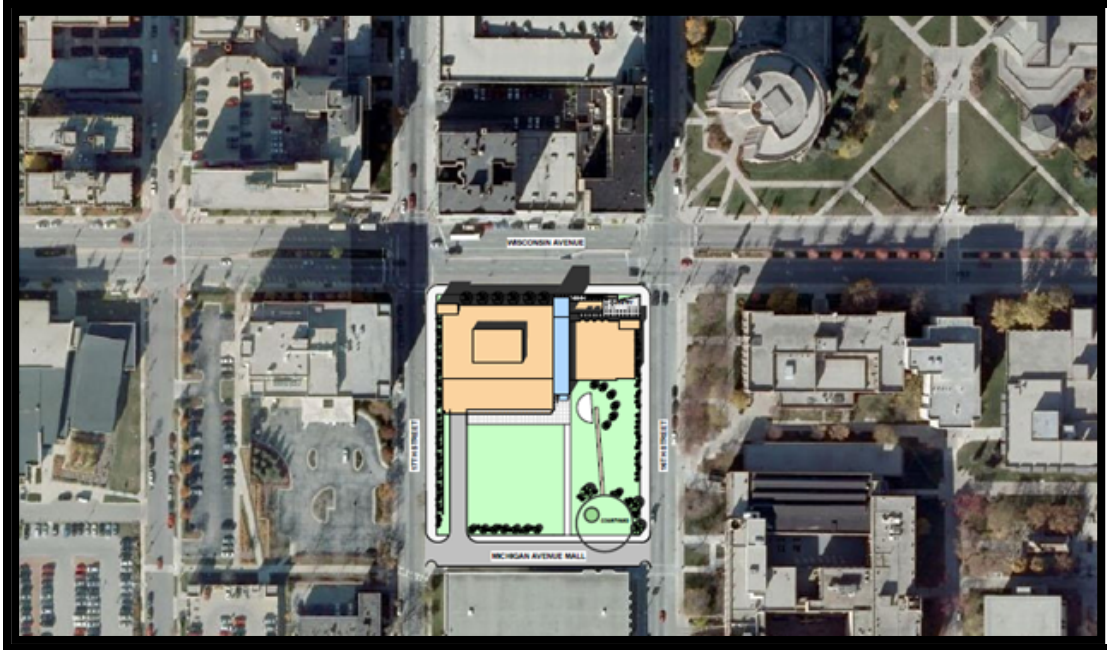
Phase 1 Site Plan, Birds-Eye View
